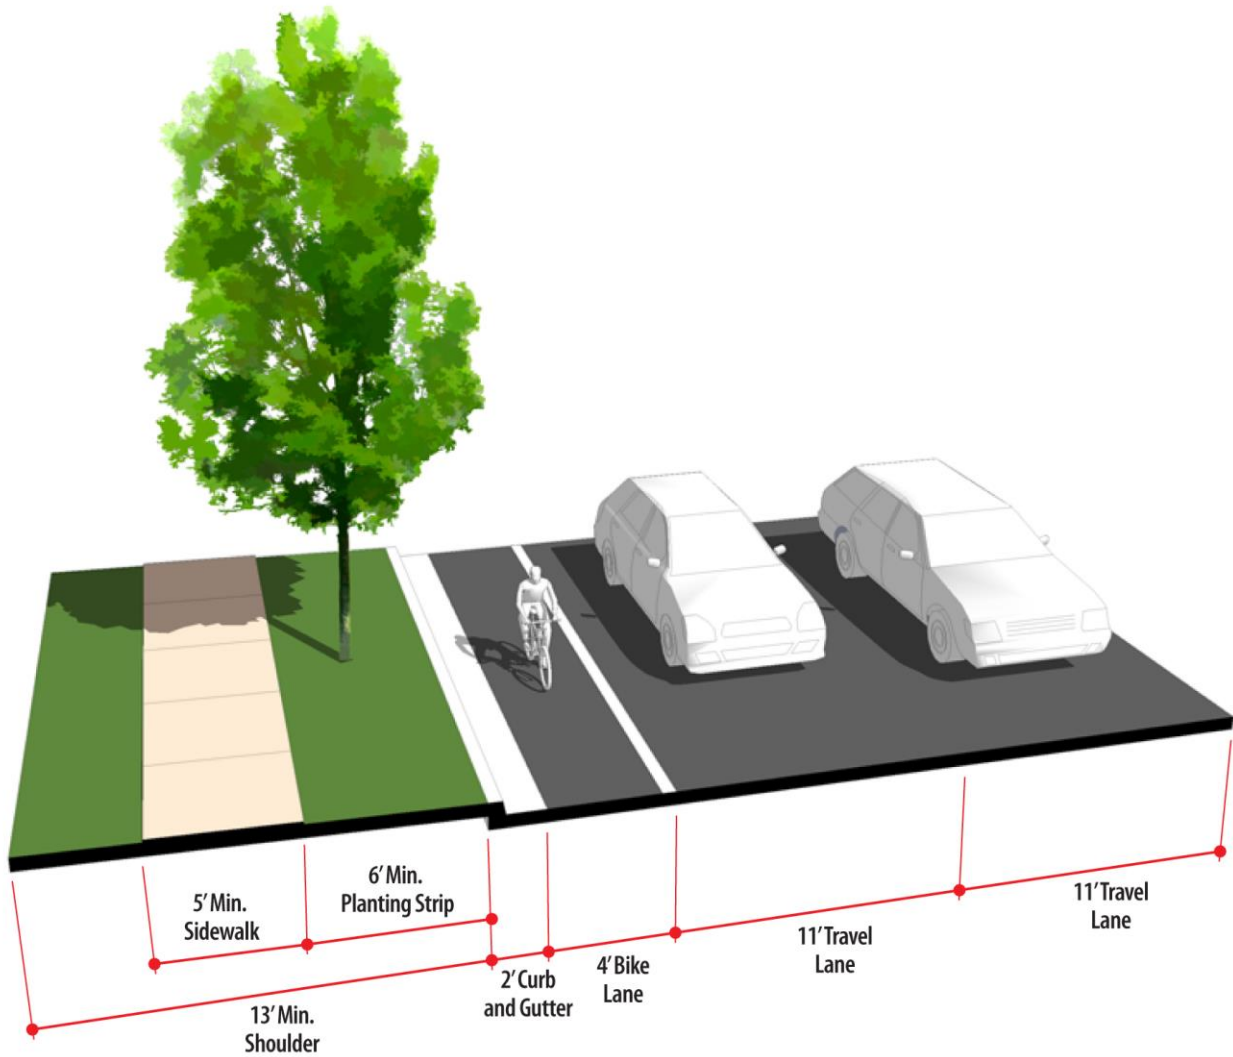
Street Cross-section (typical), Collector and Minor Arterial
